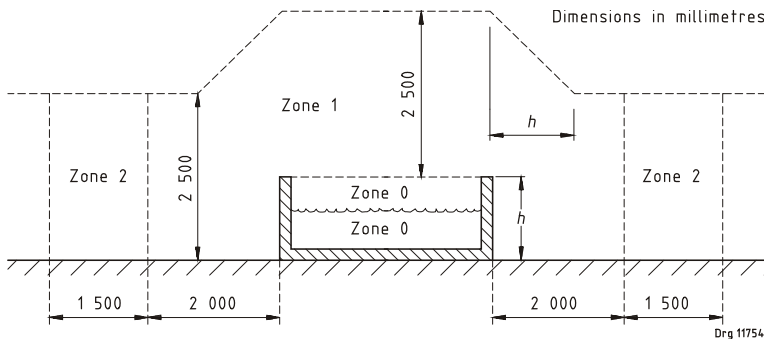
Elevation of zone dimensions for above ground pools
